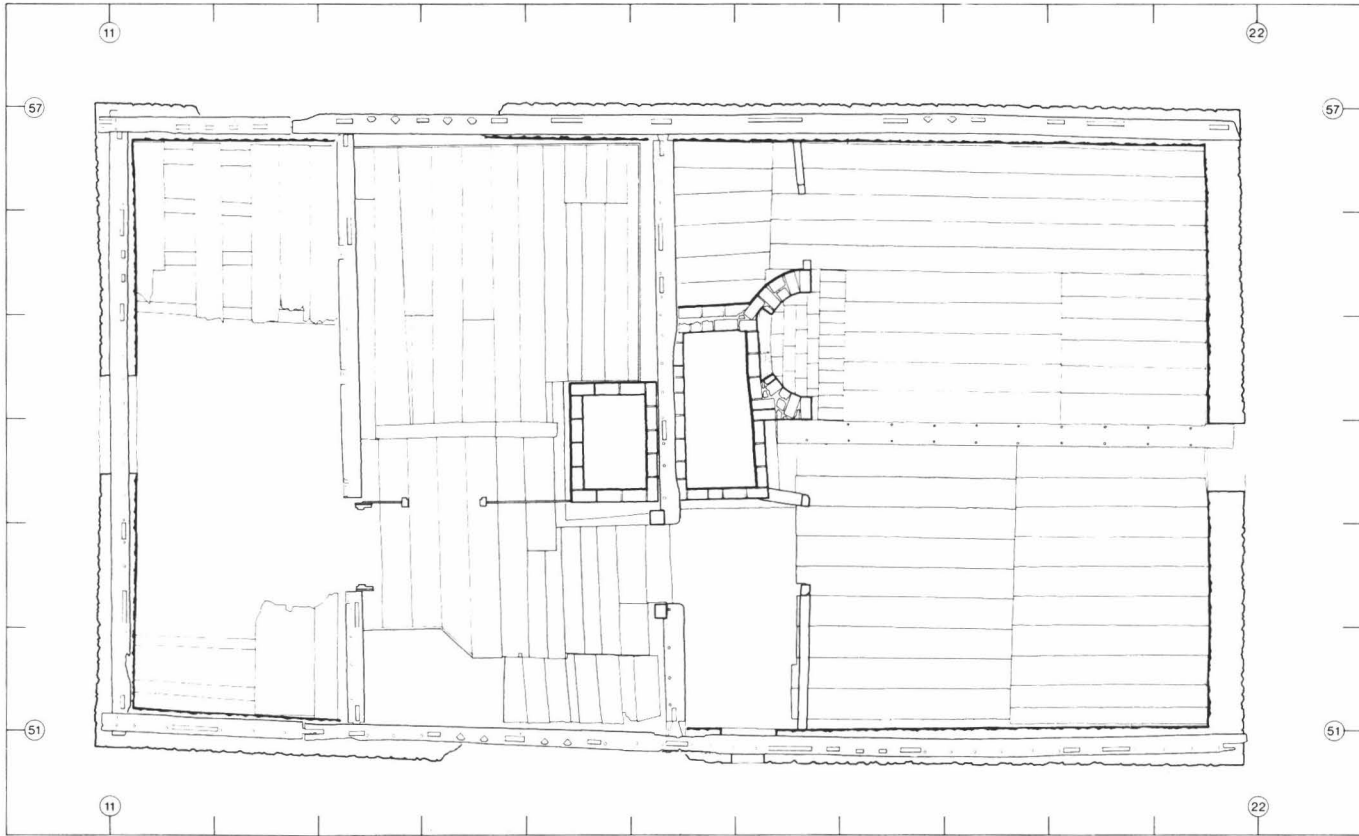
Plan at 38 m O.D., as found. The wall plates and tie beams are shown in reflected plan so that the mortices and stave holes are seen.
